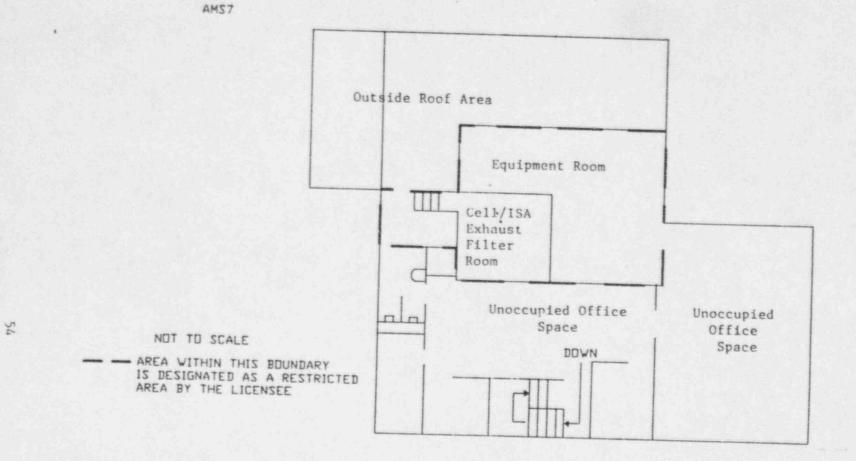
AMS Facility--Second Floor (Partial)
